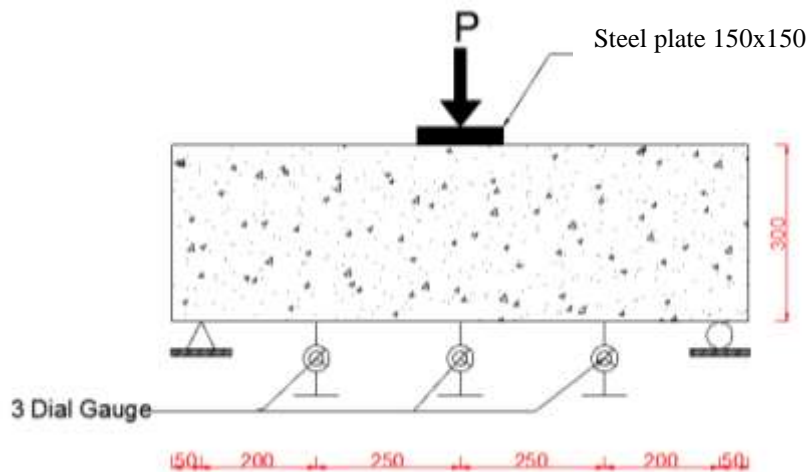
Typical Loading for all Beams (dimensions in mm).
